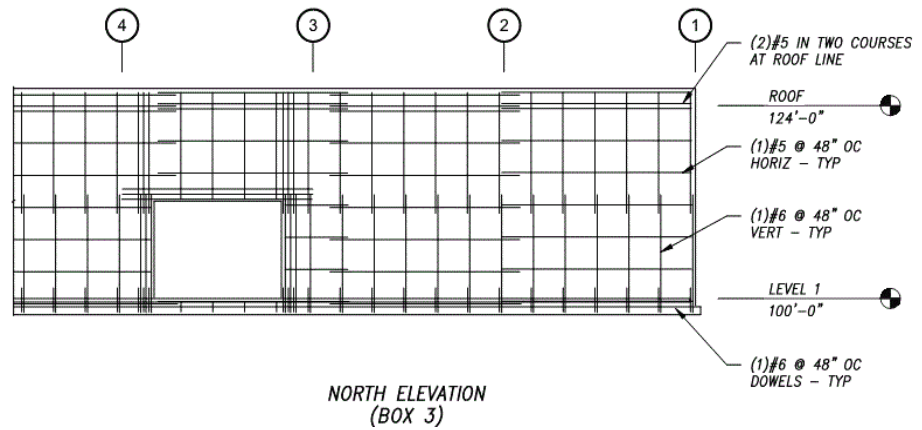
Single-story retail/industrial/warehouse building North elevation: BOX3.
